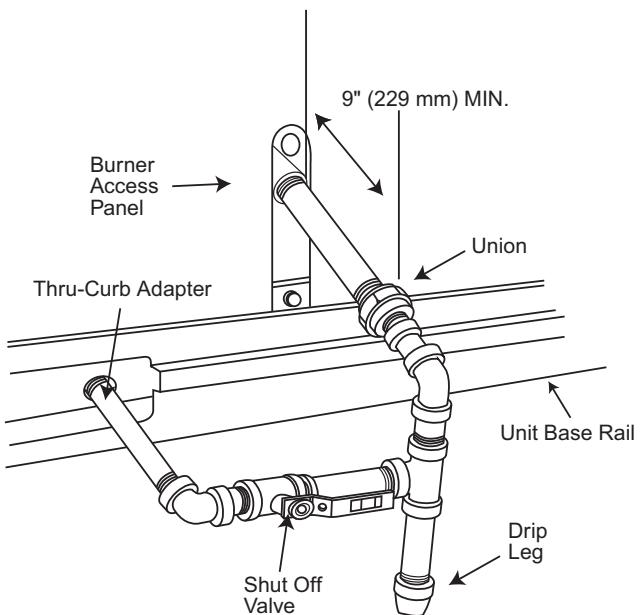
Gas Piping with Thru-Curb Accessory (Alternate Layout)
